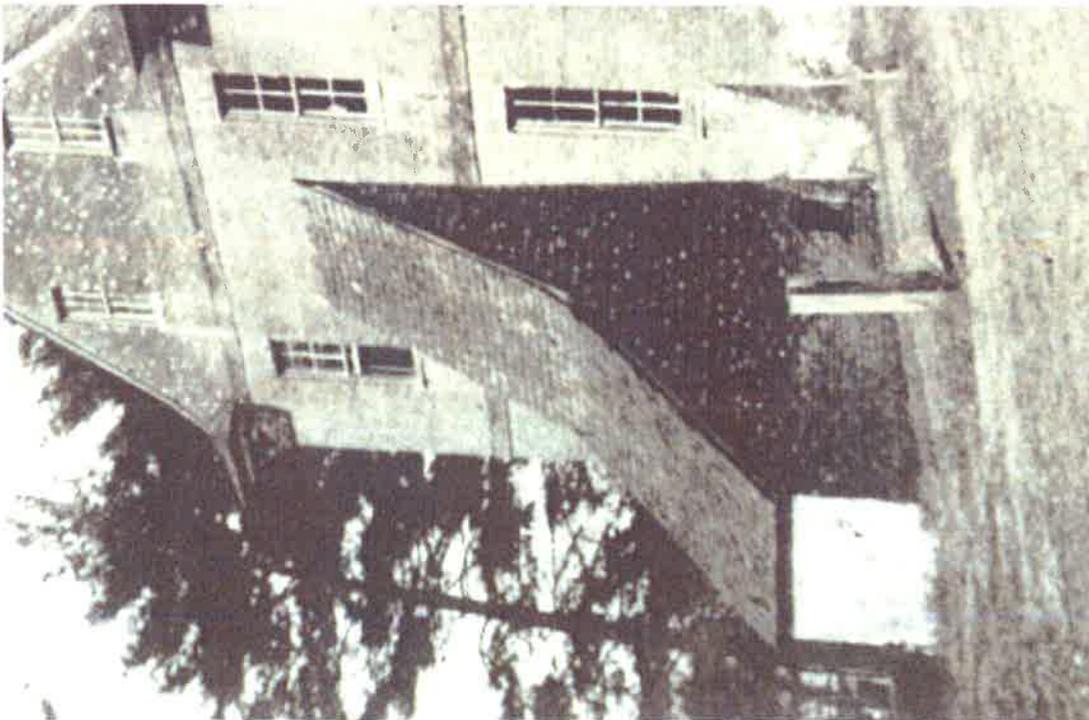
Buttress ca. 1890, prior to Colonial Revival changes to Bostwick House and property. Note wooden shingle roof on buttress and glazed header brick on east wall.
